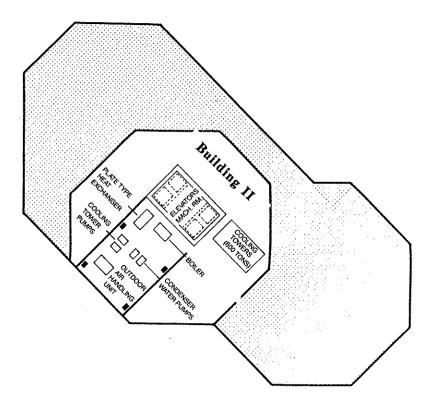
H BUILDING ELEVATION FLOOR PLANS
